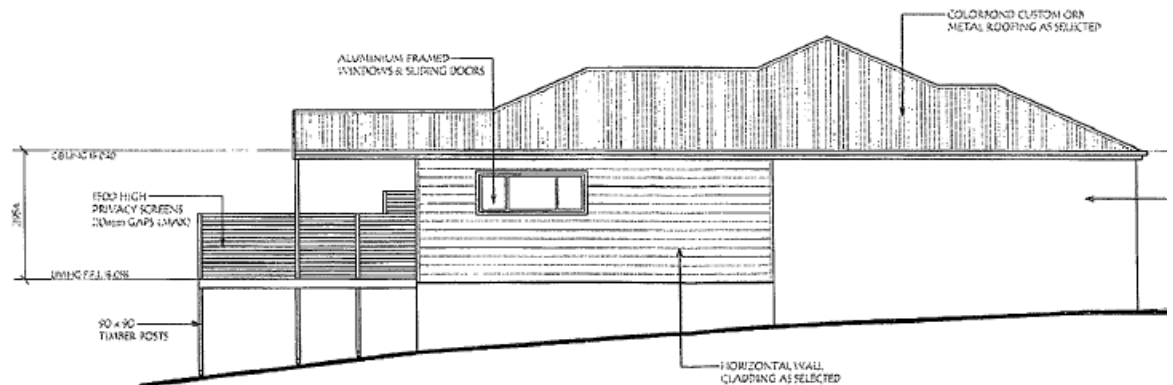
south western elevation of dwelling at 176a Lawrence Hargrave Drive.
